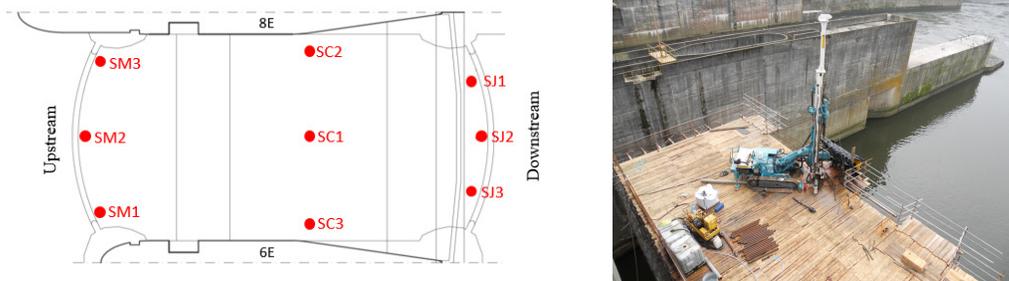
Boreholes location plan and view of the execution of the downstream boreholes.
